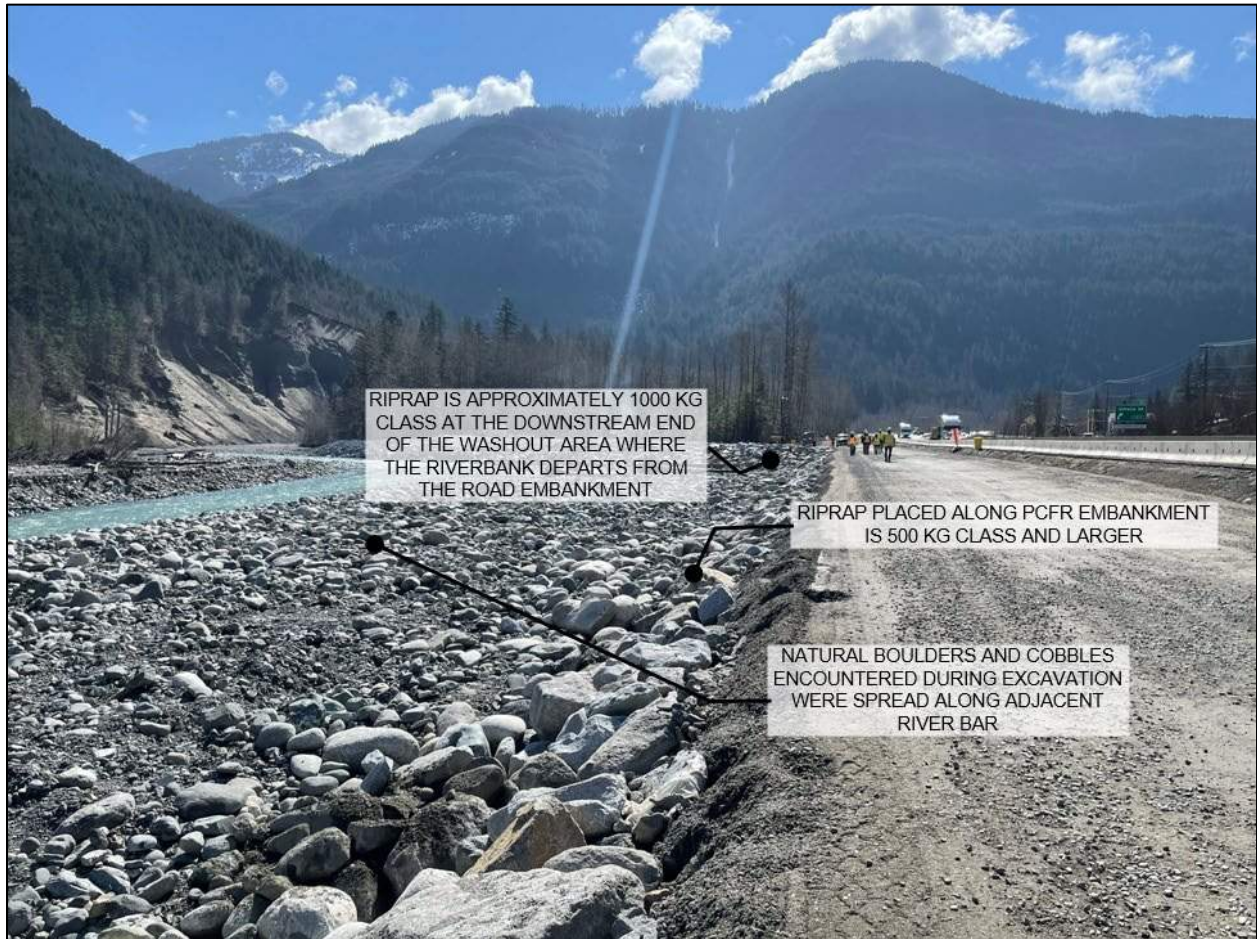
View of interim road repairs looking downstream (south). Photo Source: BGC, March 21, 2023.
